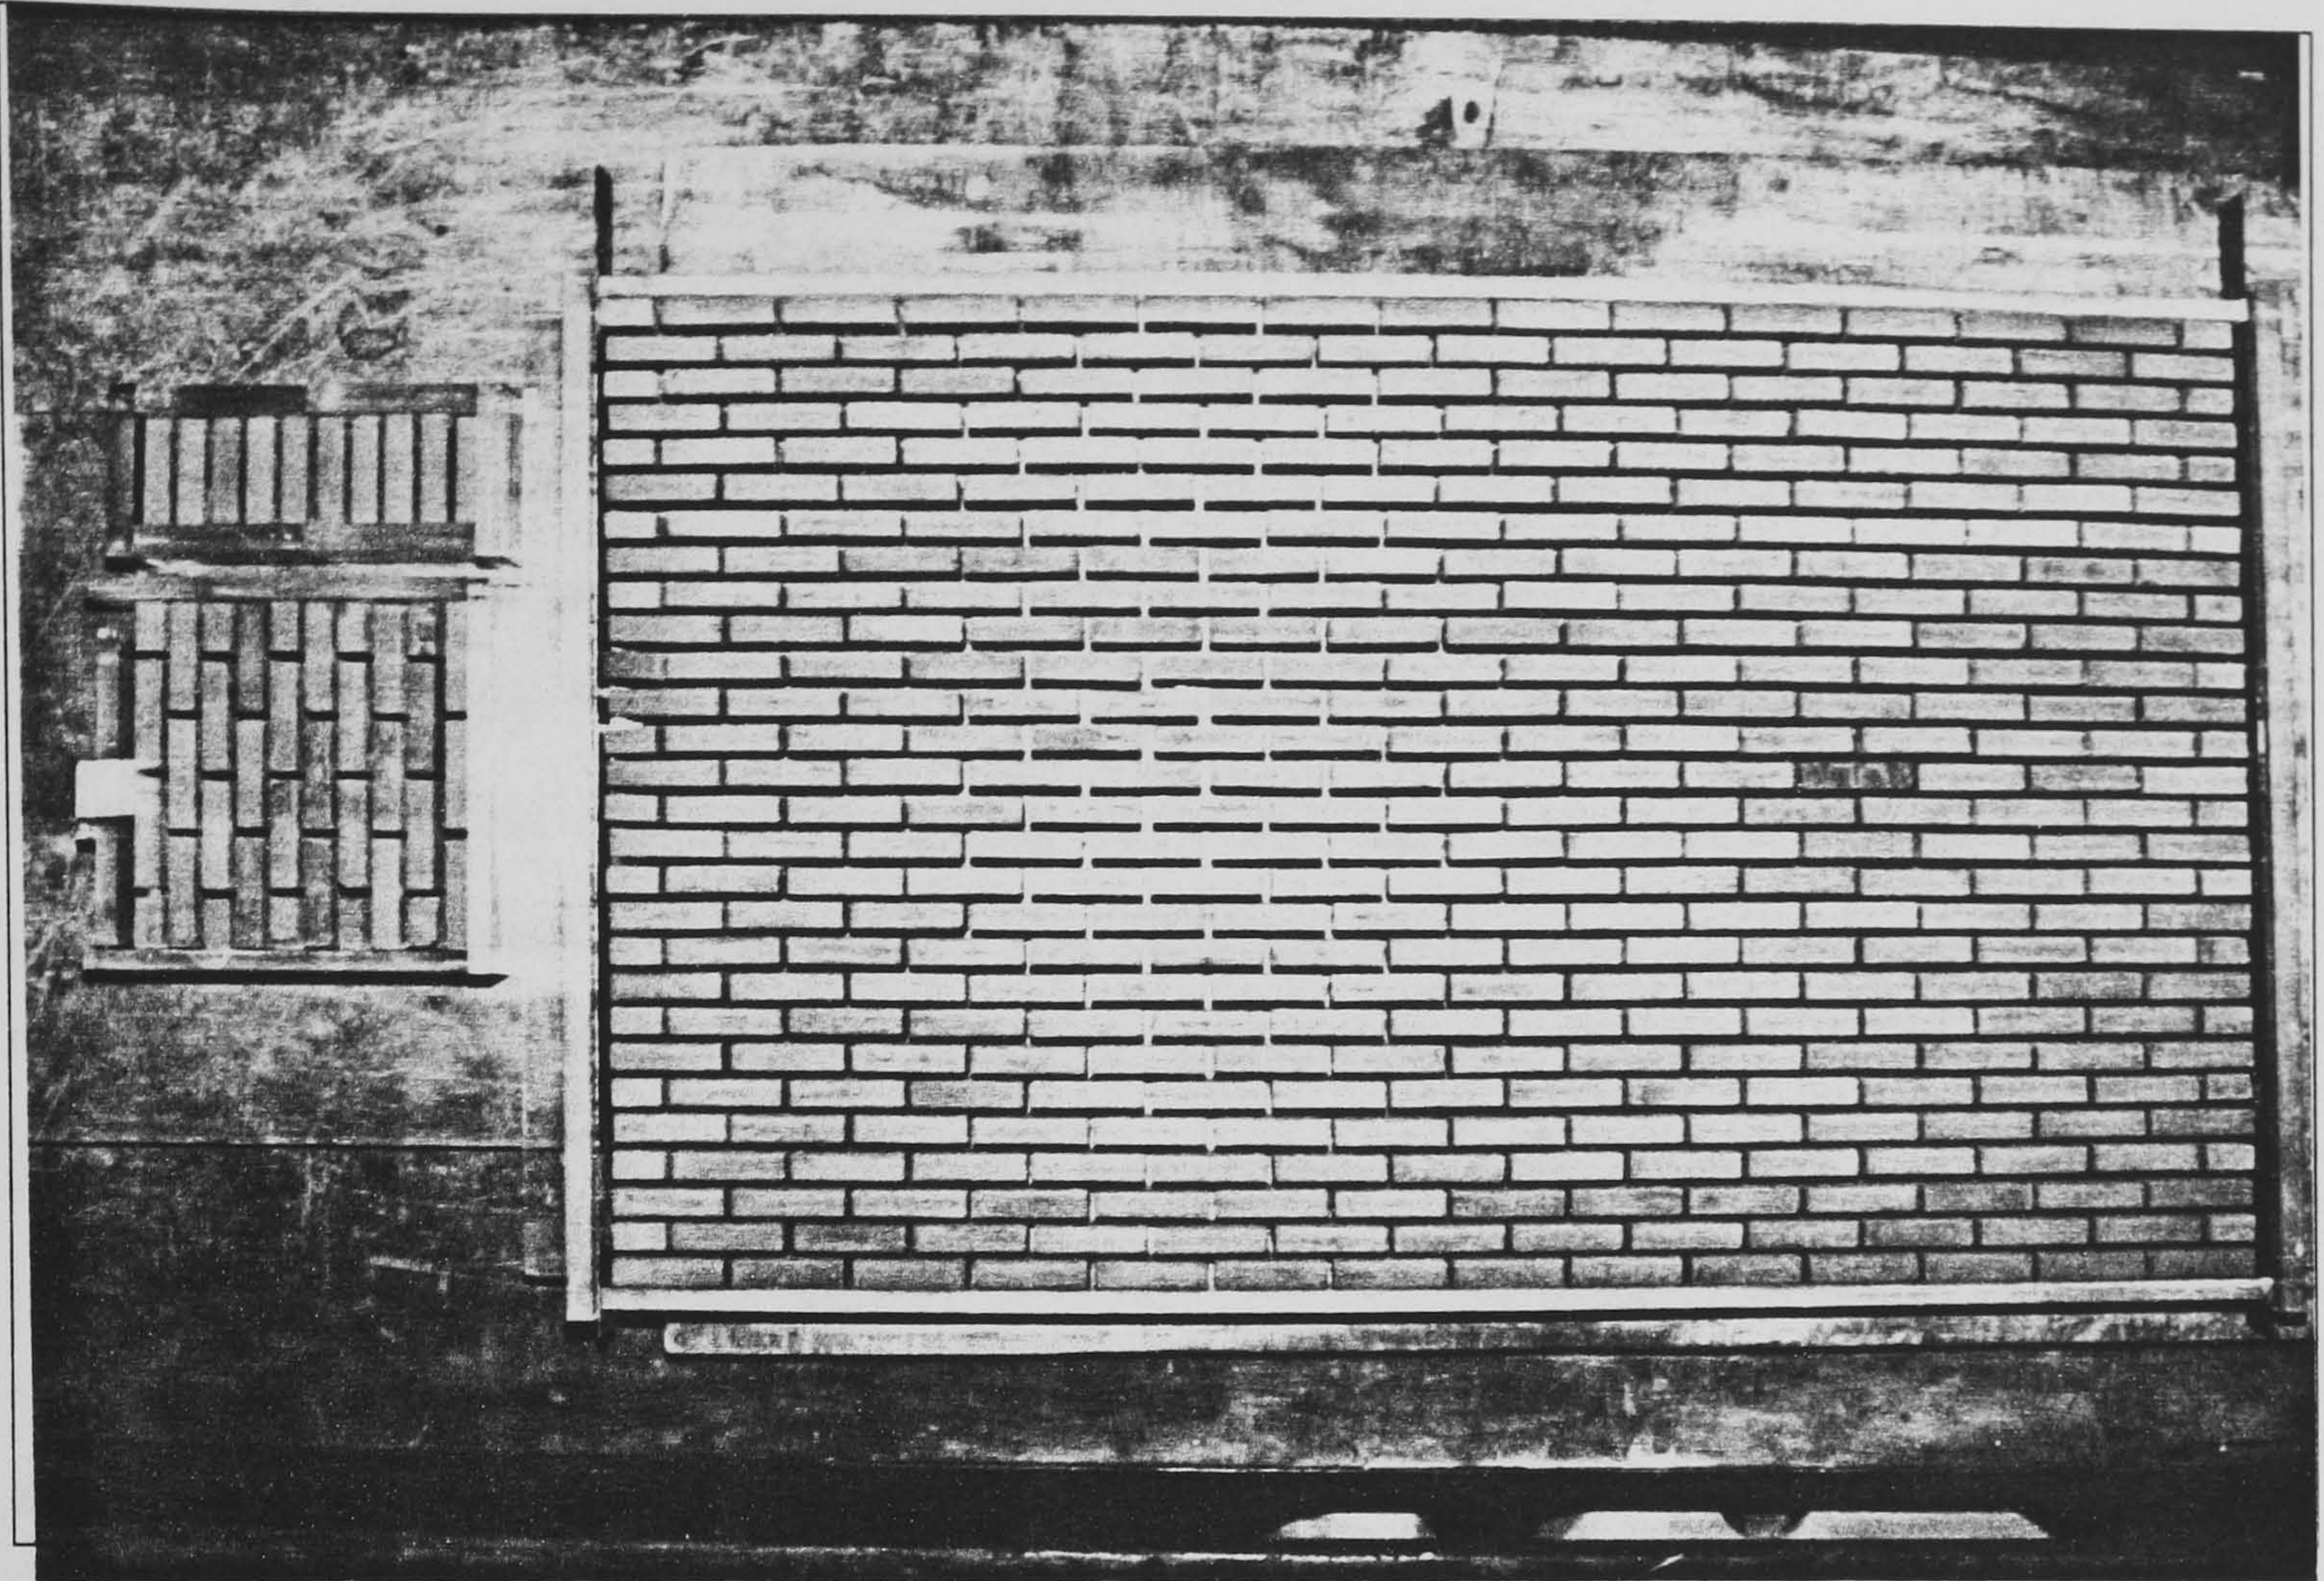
Brick wall and control specimens glued on Perspex casing
